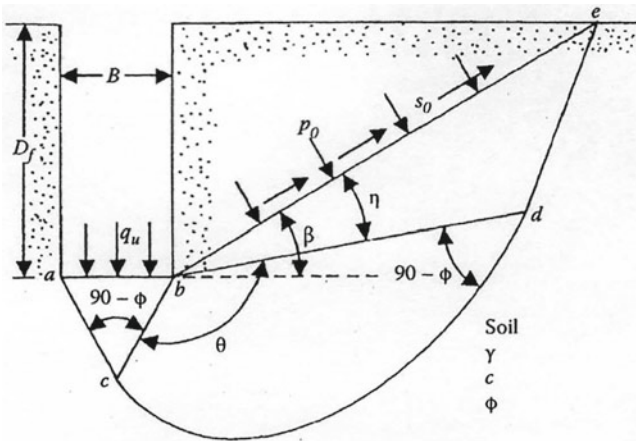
Failure surface in soil under a rough rigid strip foundation—Meyerhof solution (1951)
